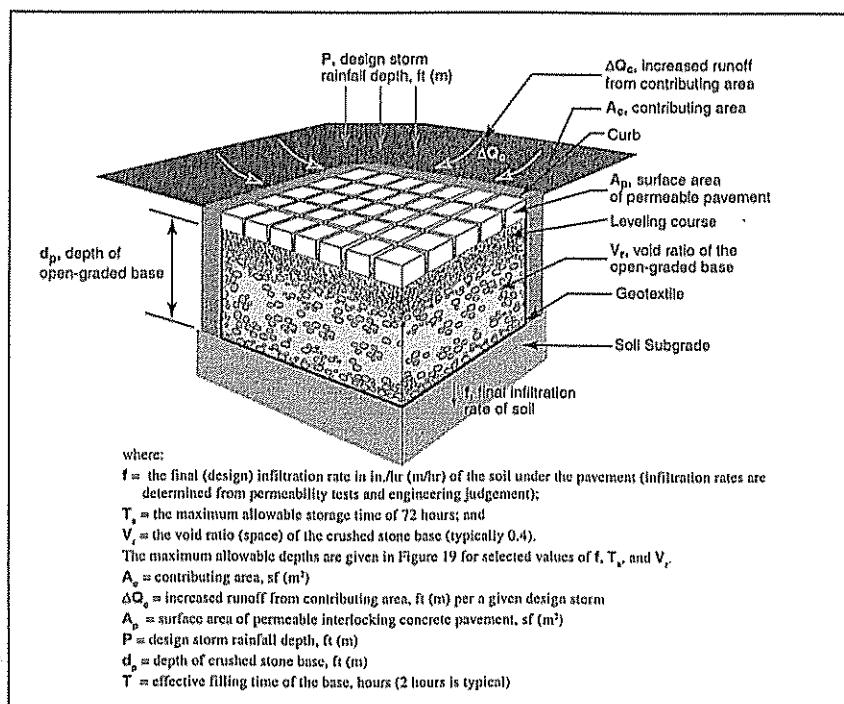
Design parameters for calculating the base depth for permeable interlocking concrete pavements.
